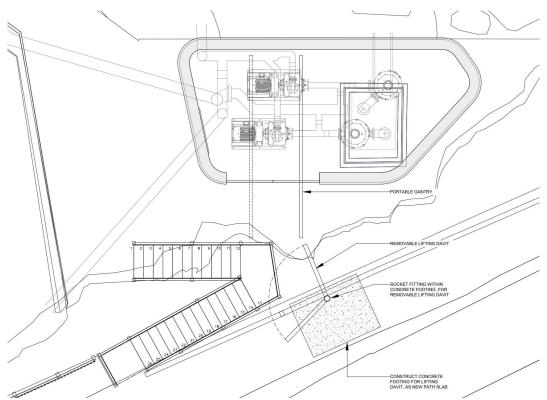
Civille plan showing the proposed pumphouse, pump machinery and section of cliff concrete path (stippled) that would need to be demolished and rebuilt as a footing to support a removable lifting davit. This mechanism, in association with the portable gantry, would enable faulty pump machinery to be lifted from the pumphouse to the cliff path and taken away for service or replacement. Source: Panov-Scott.
